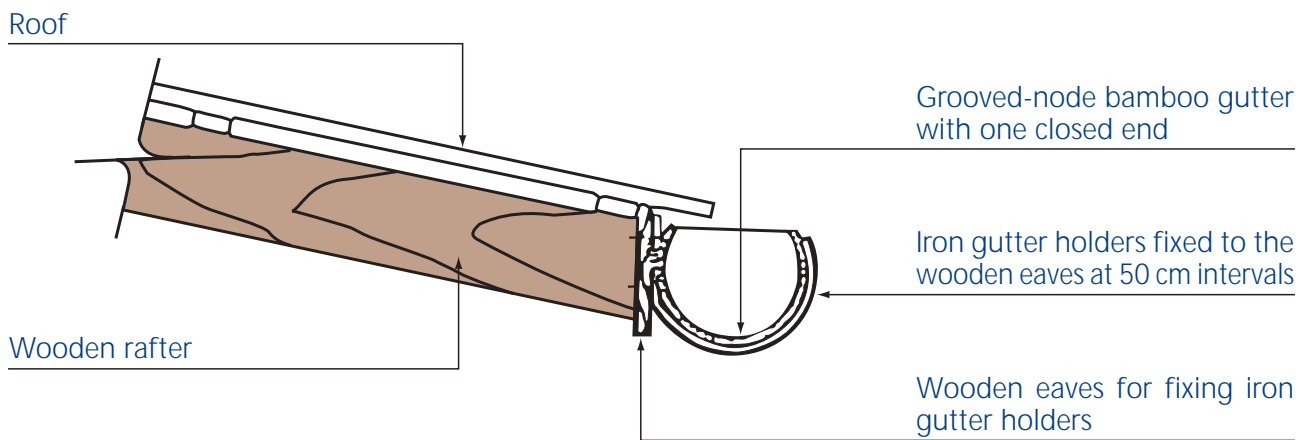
Fix the bamboo gutter with iron gutter holders to wooden roof structure using wooden eaves.
